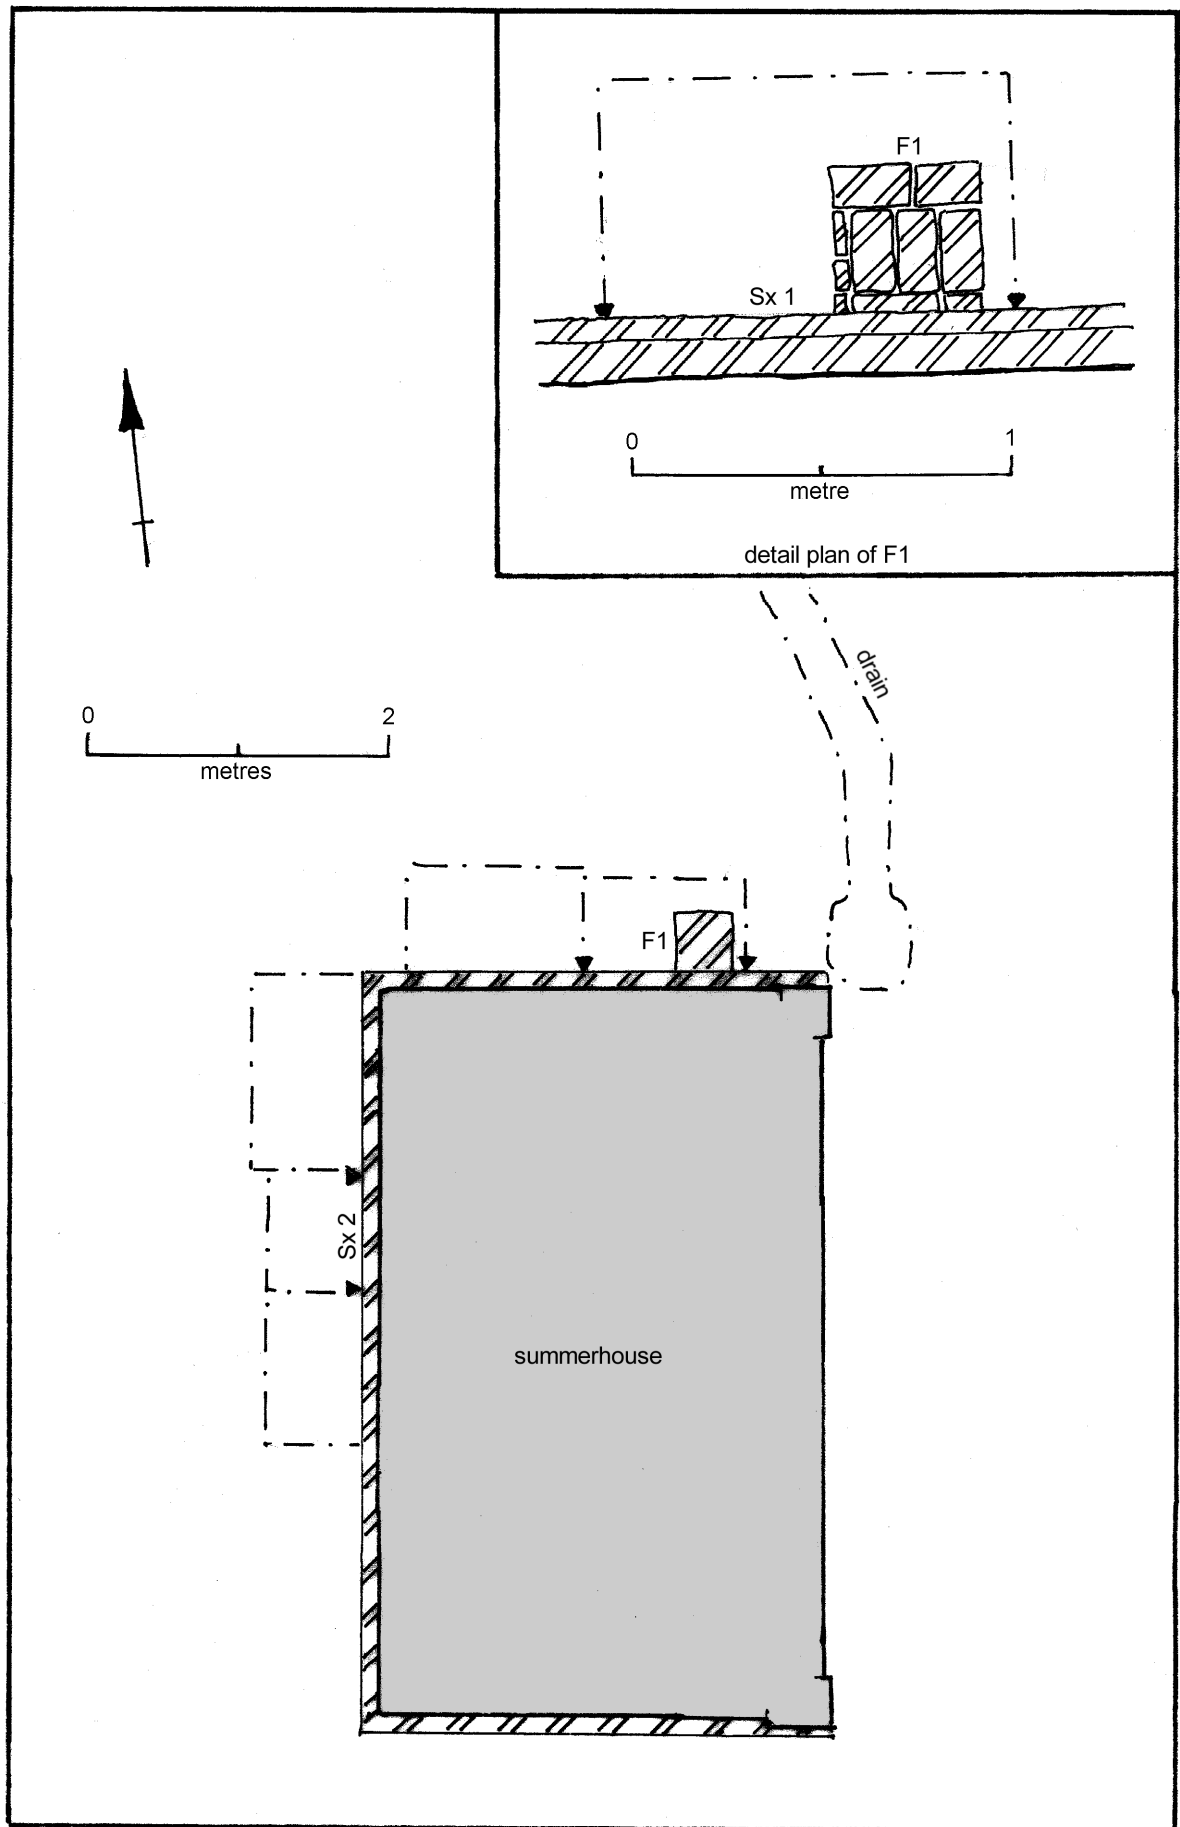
Plan of the summerhouse, showing the position of the trenches and of F1.
